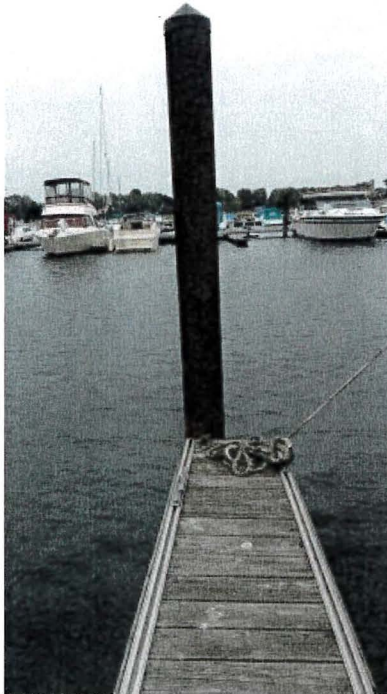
West Main – Dock F. Pile 21. Steel Wire instead of Pile Guide. Welded Capping U Section and Bearing Pad Failed
